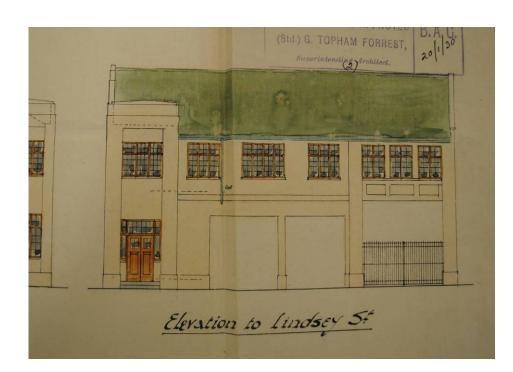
1930 drawing showing Lindsey Street elevation (Source – LMA, GLC/AR/BR/22/BA/043620)
